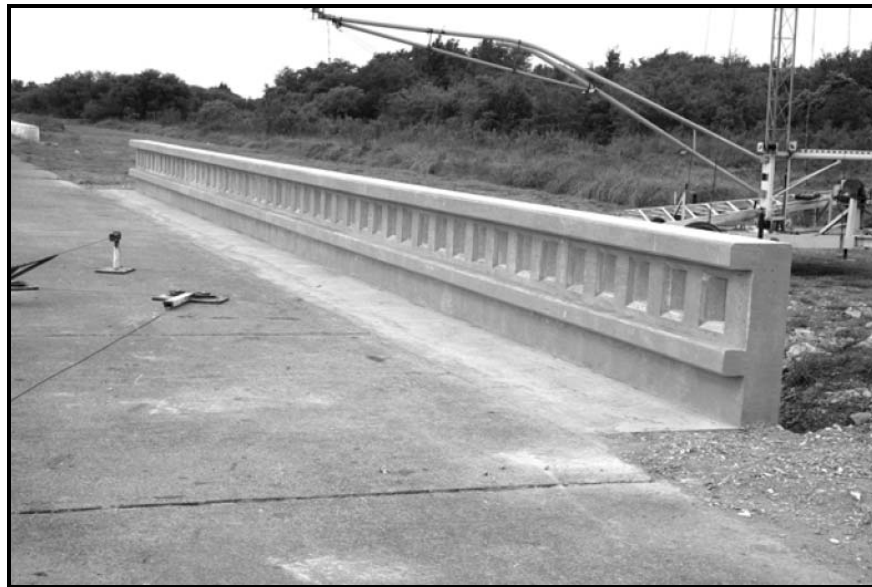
NDOR Aesthetic Open Concrete Bridge Rail
